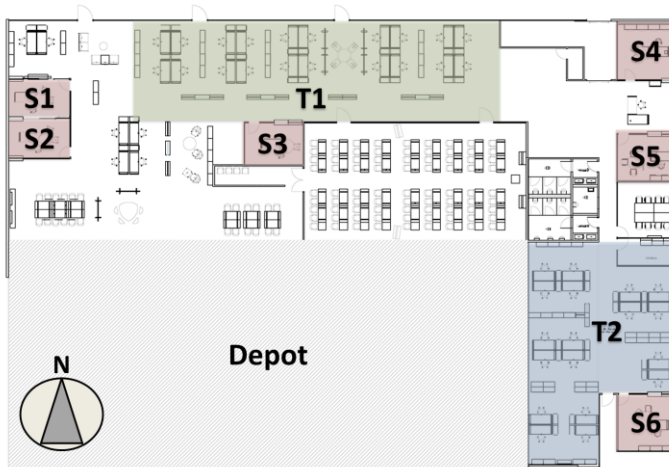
Layout of the office floor. Zones with application of water walls are highlighted in color.
